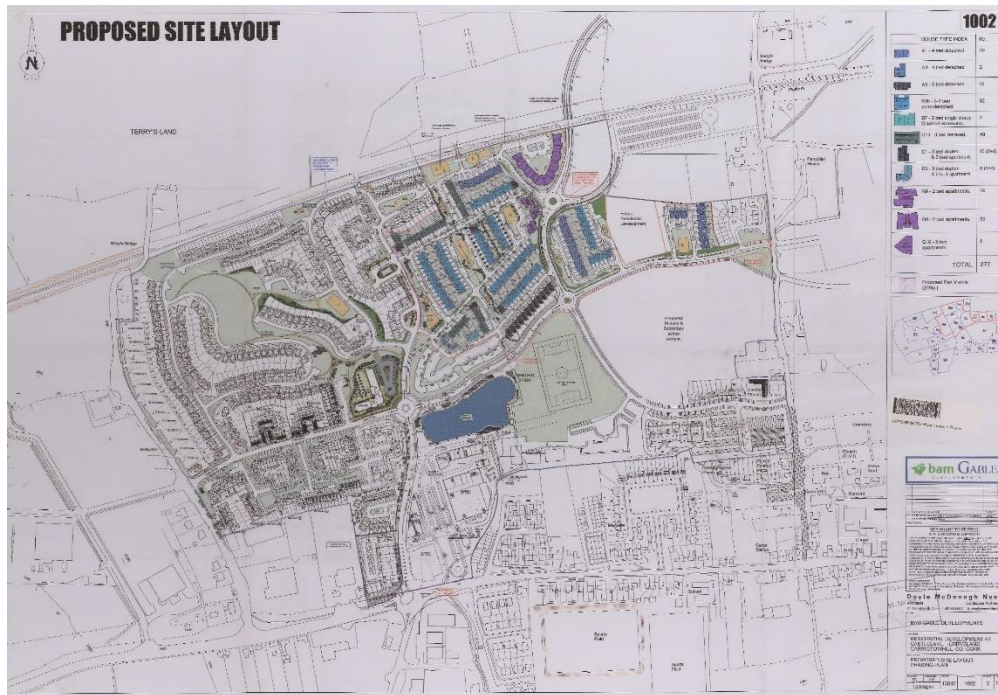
2017 Layout Masterplan, Planning Ref 17/5399
